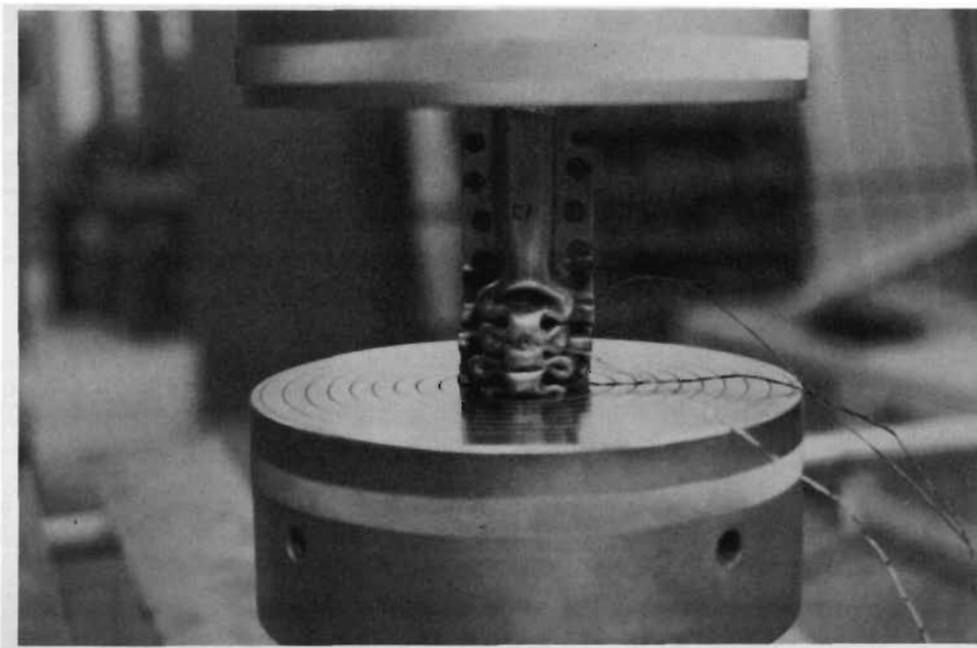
Typical Failure of a Stub Column with small w/t Ratio (Spec. 1B1E1)
